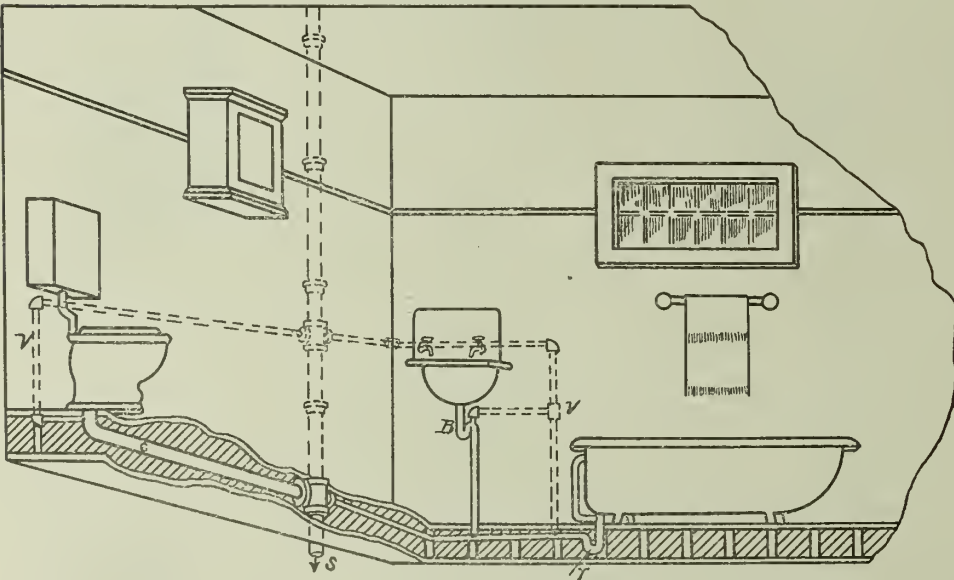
An example of back-vented plumbing as applied to the bathroom.
